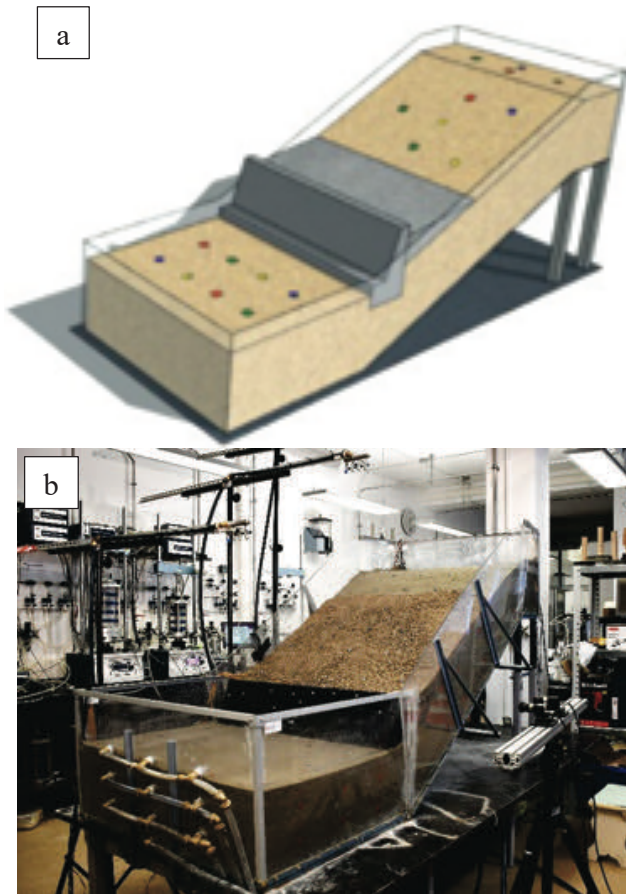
Small-scale model built in sandy material with installed retaining gravity wall: a) schematic views at the model; b) prepared model with installed retaining gravity wall ready for testing.
